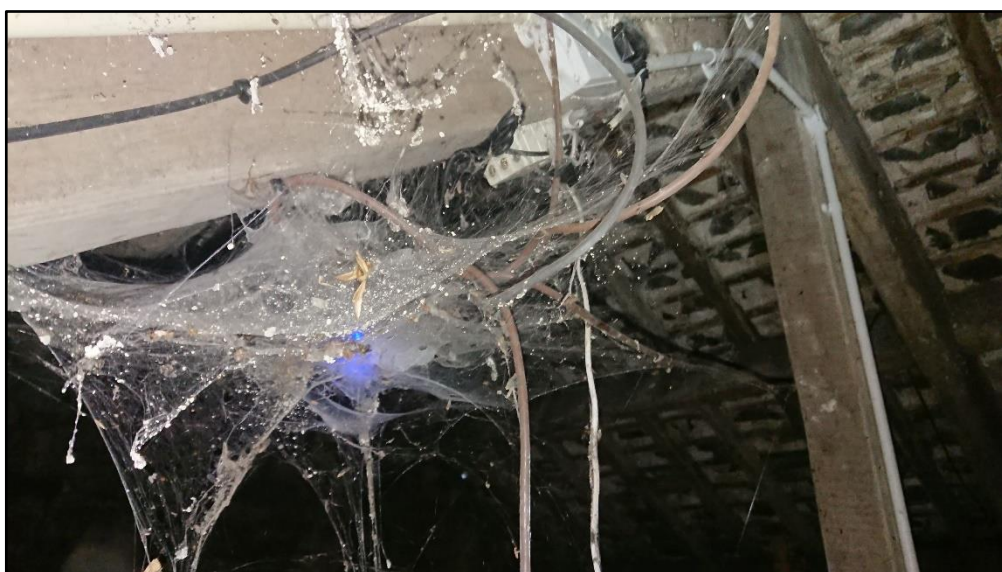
Close-up showing where the main building and outbuildings are adjoined.
